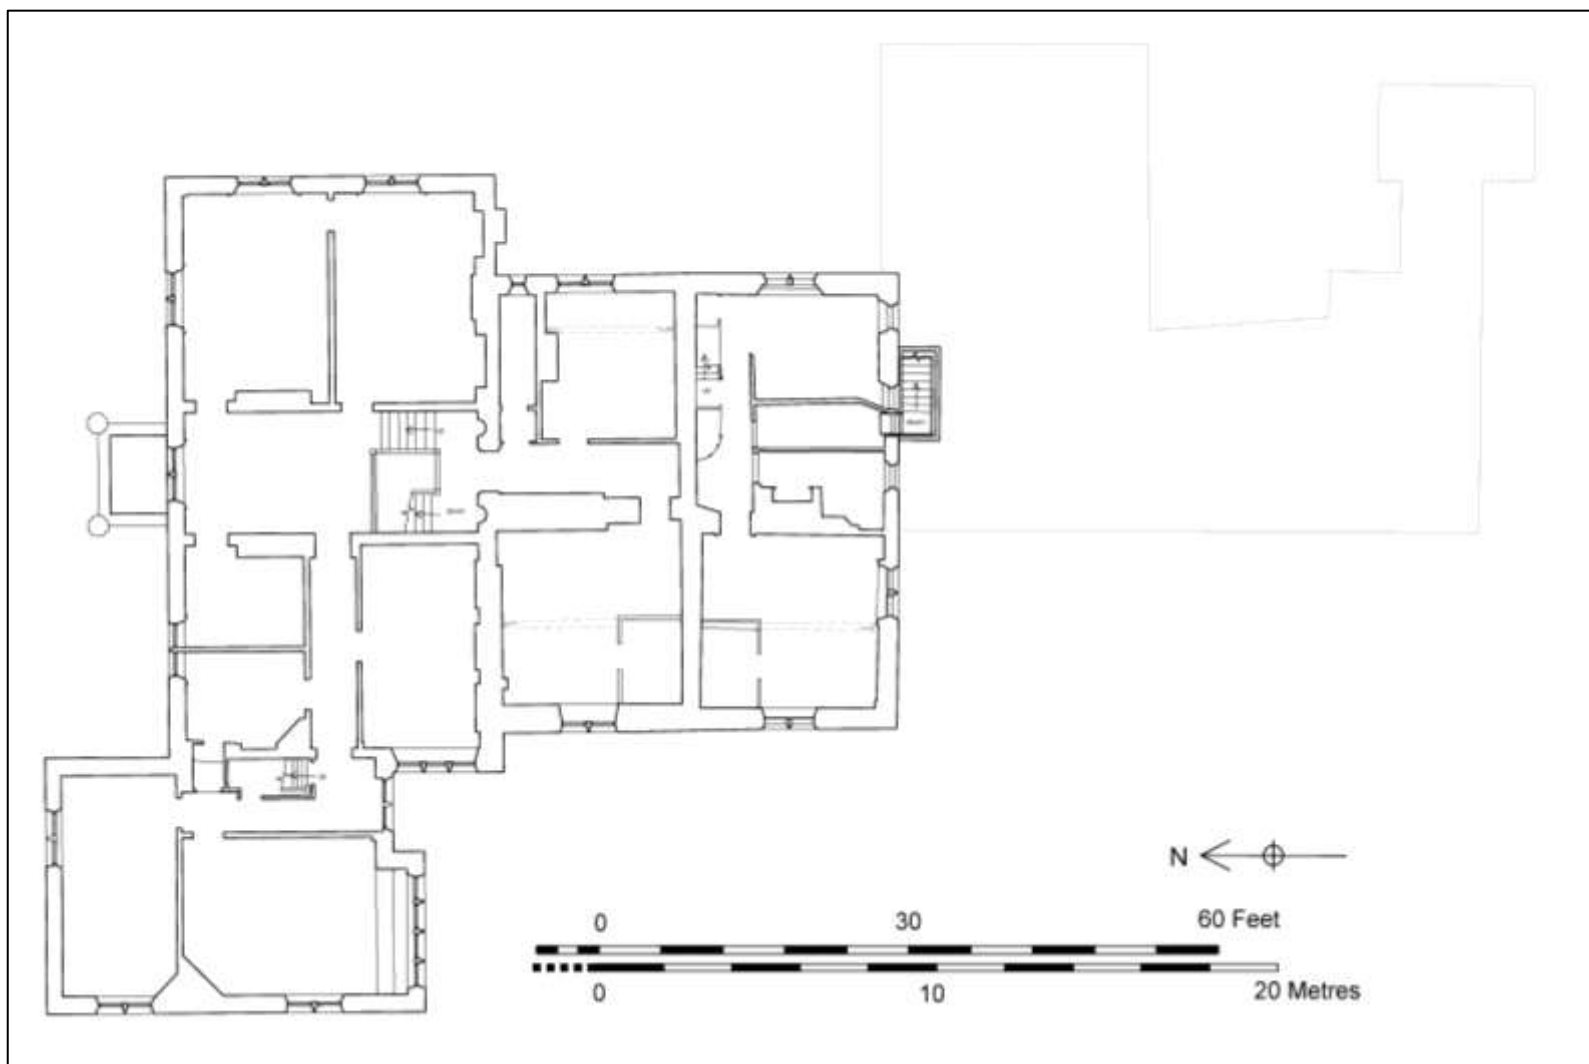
Existing first floor plan, derived from Nick Cox Architect survey drawing.
